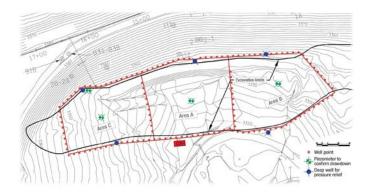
West Dam Dewatering System Layout (MRCE, 2010).
